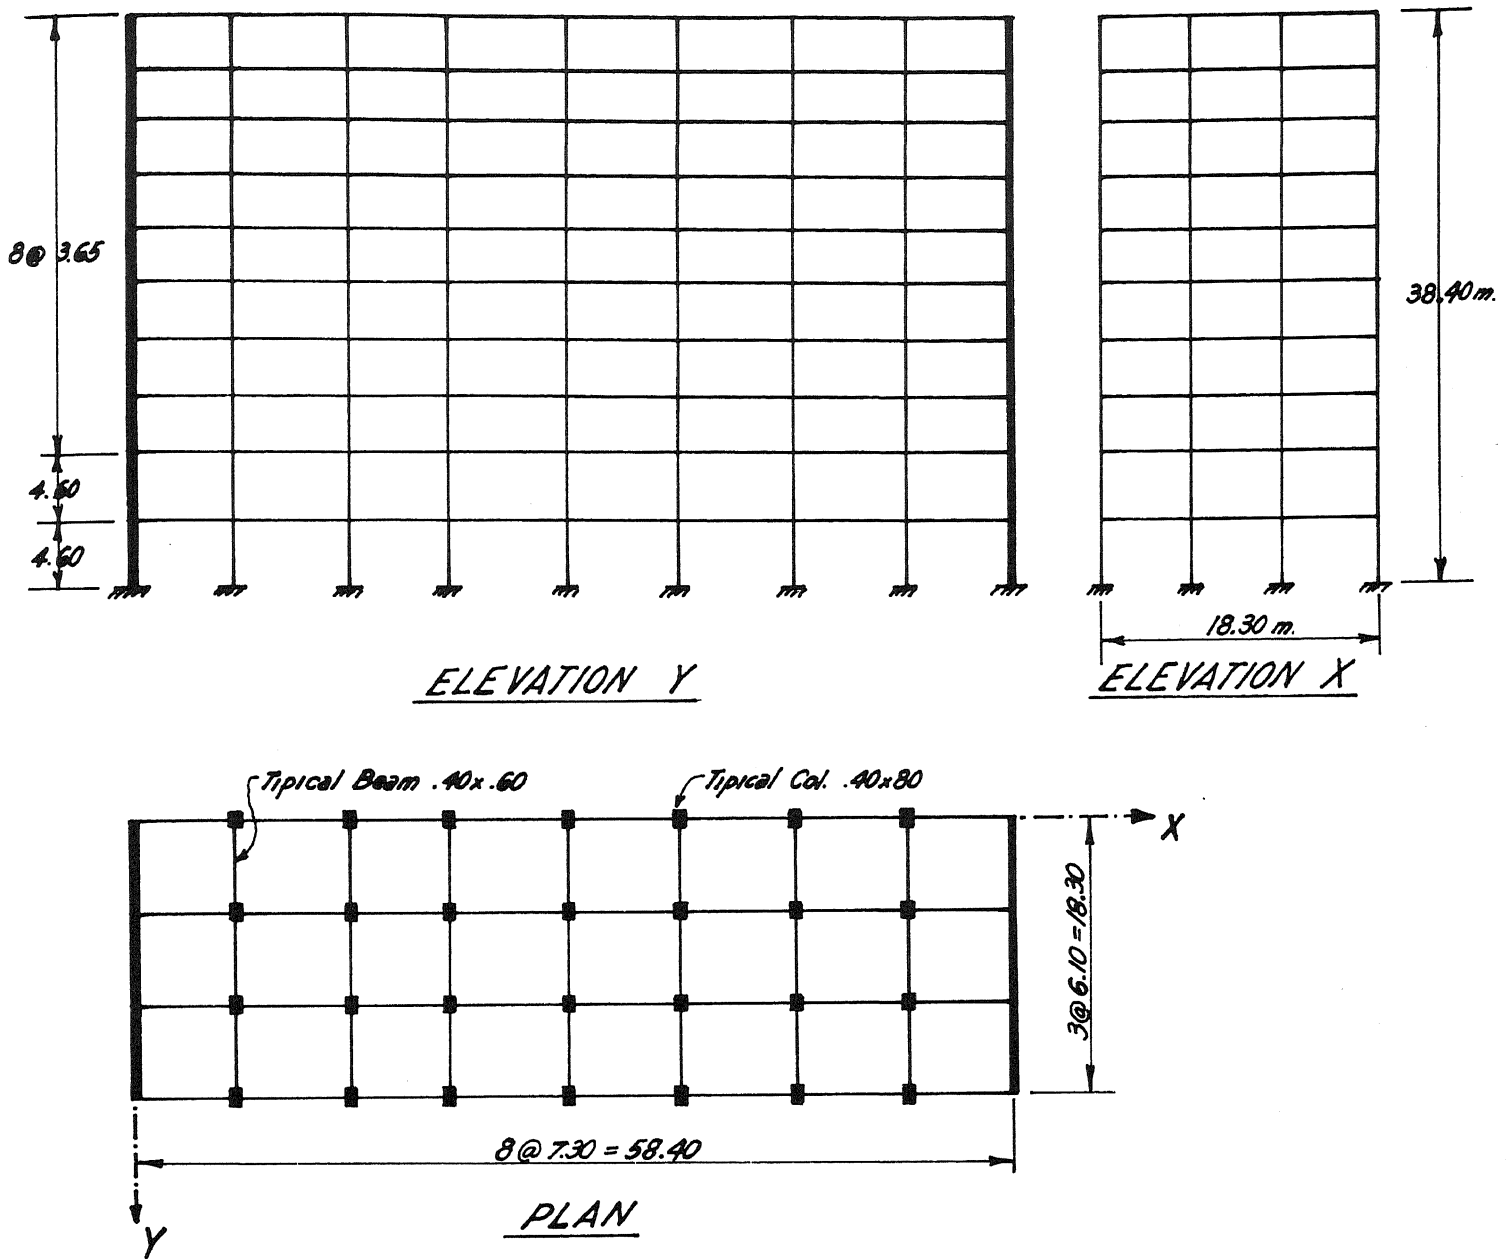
DESIGN EXAMPLE - PLAN AND ELEVATION
